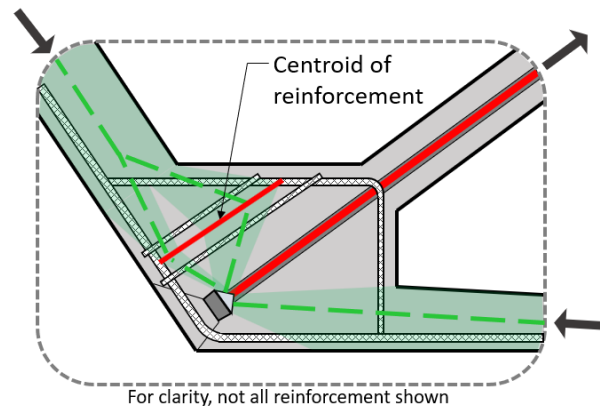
The strut-and-tie model used to determine hanger reinforcement at PT anchorage.
